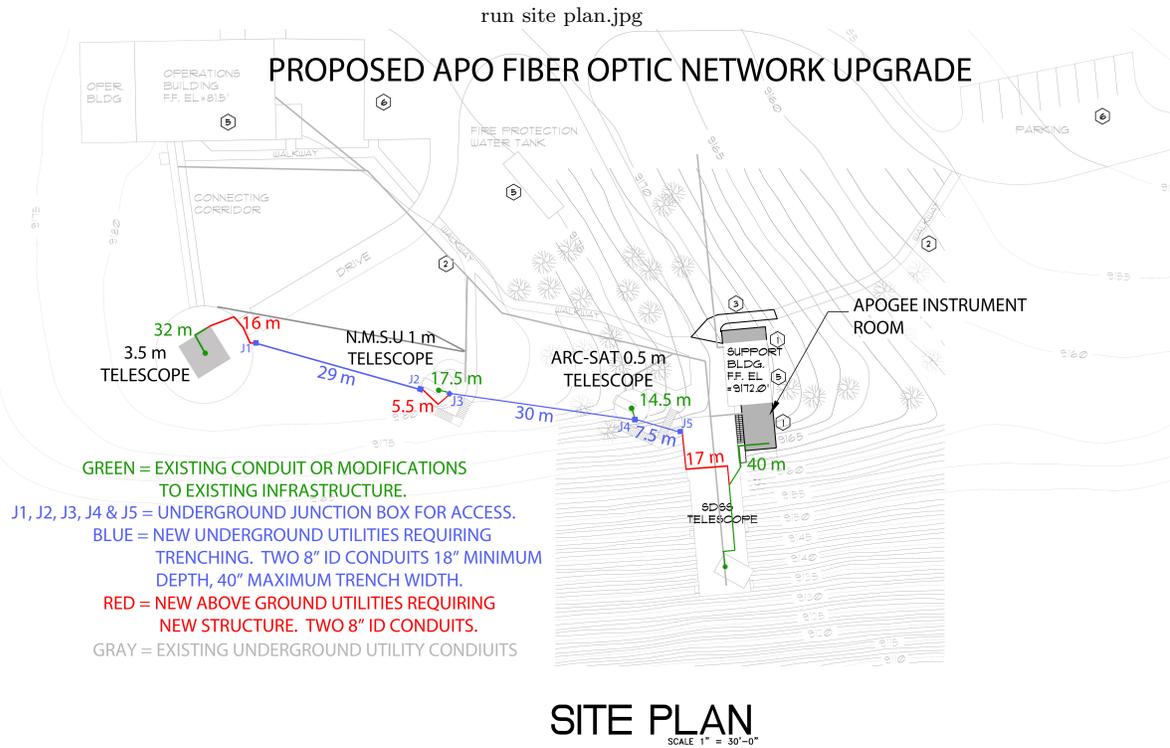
Proposed path of a new fiber optic network for Apache Point Observatory. Green lines and dimensions indicate existing cable trays or utility conduits which could be used. Red lines indicate areas where new cable trays would need to be installed. Blue lines and boxes represent new utility trenches for routing fibers underground over long runs that would require digging on site. All existing utility conduits are marked with Gray lines. The existing conduits are not adequate due to long path lengths and small size. Many of these existing conduits have also been crushed since their installation.
